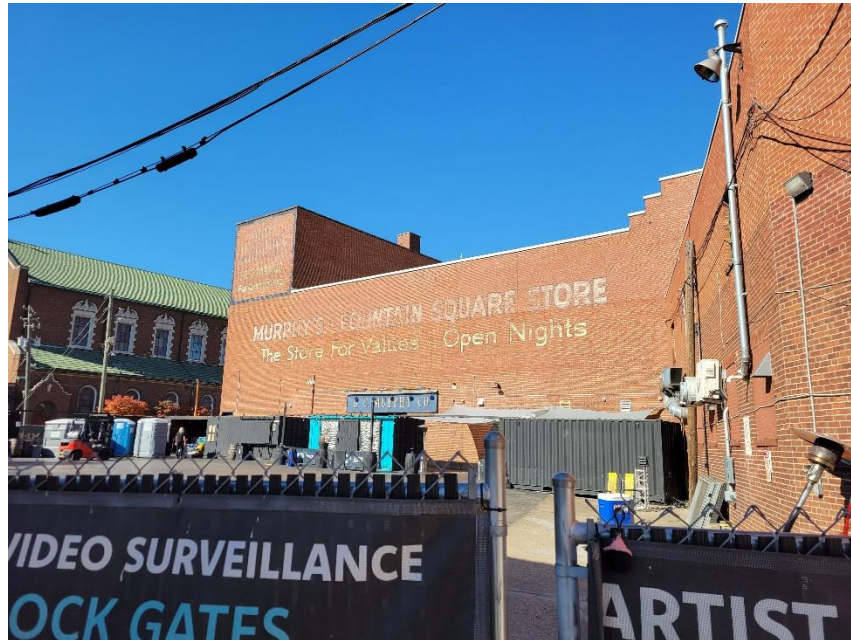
Improvements Encroaching Into Alley Viewed from Southeast
